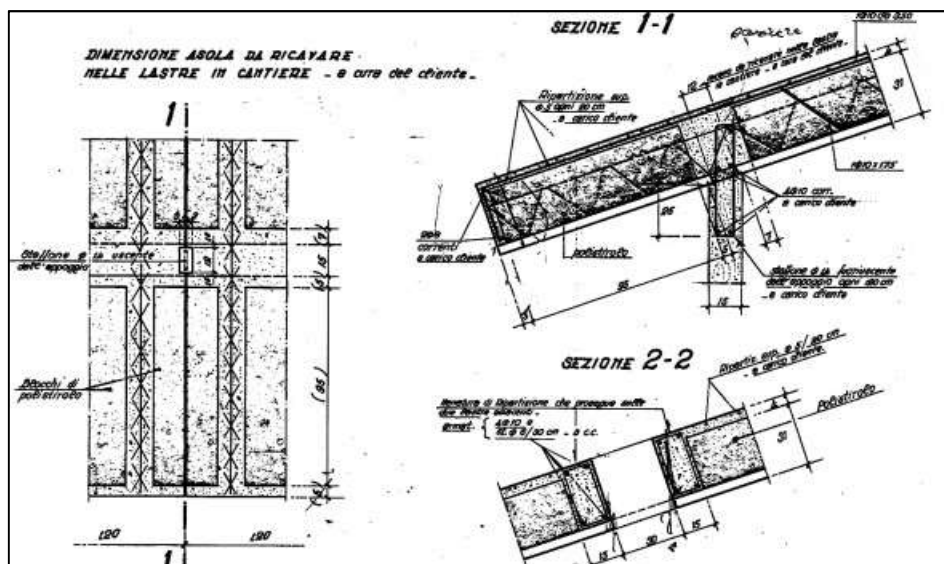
Typical sections of Celerpan covering slab. (D/7608_F165.2 T9)
